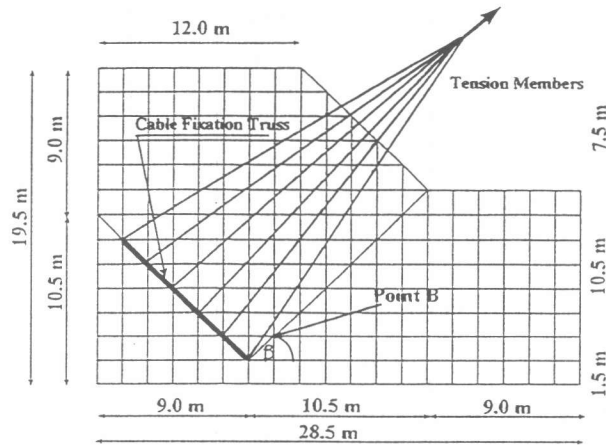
Typical mesh for the cable anchorage connection (case of crack inclination angle $\beta = 45$ degree)
